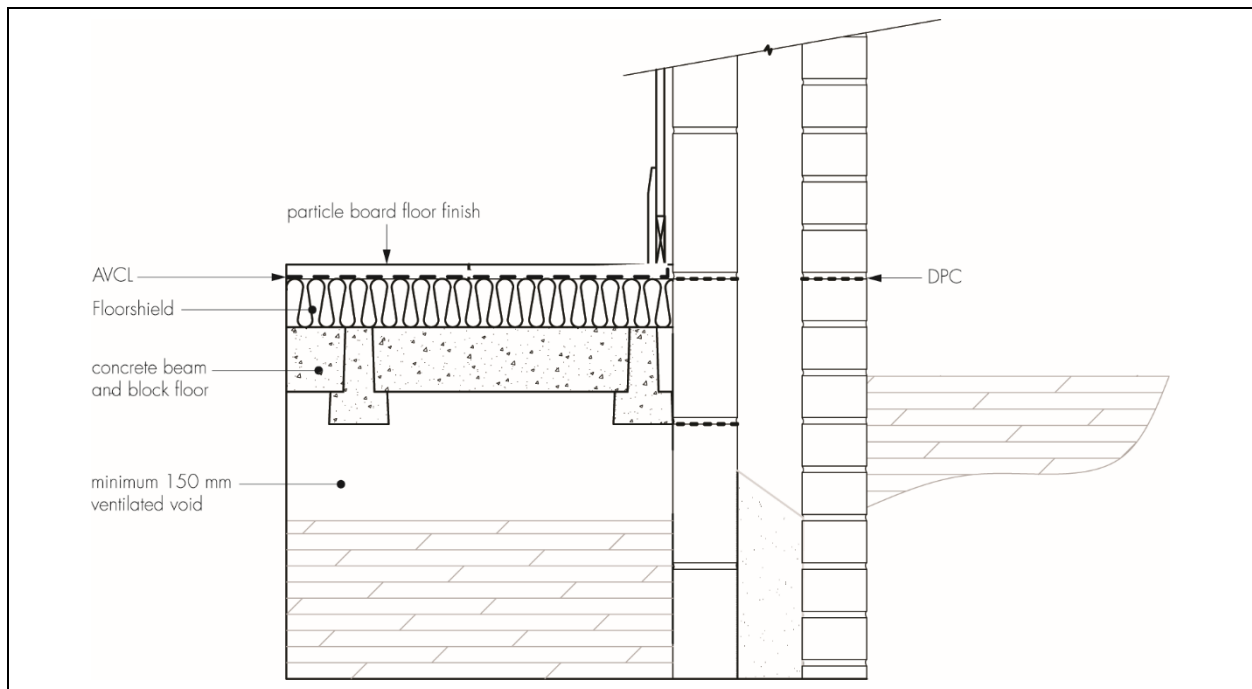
Typical installation details — suspended concrete ground floor with AVCL only (particle board finish)
